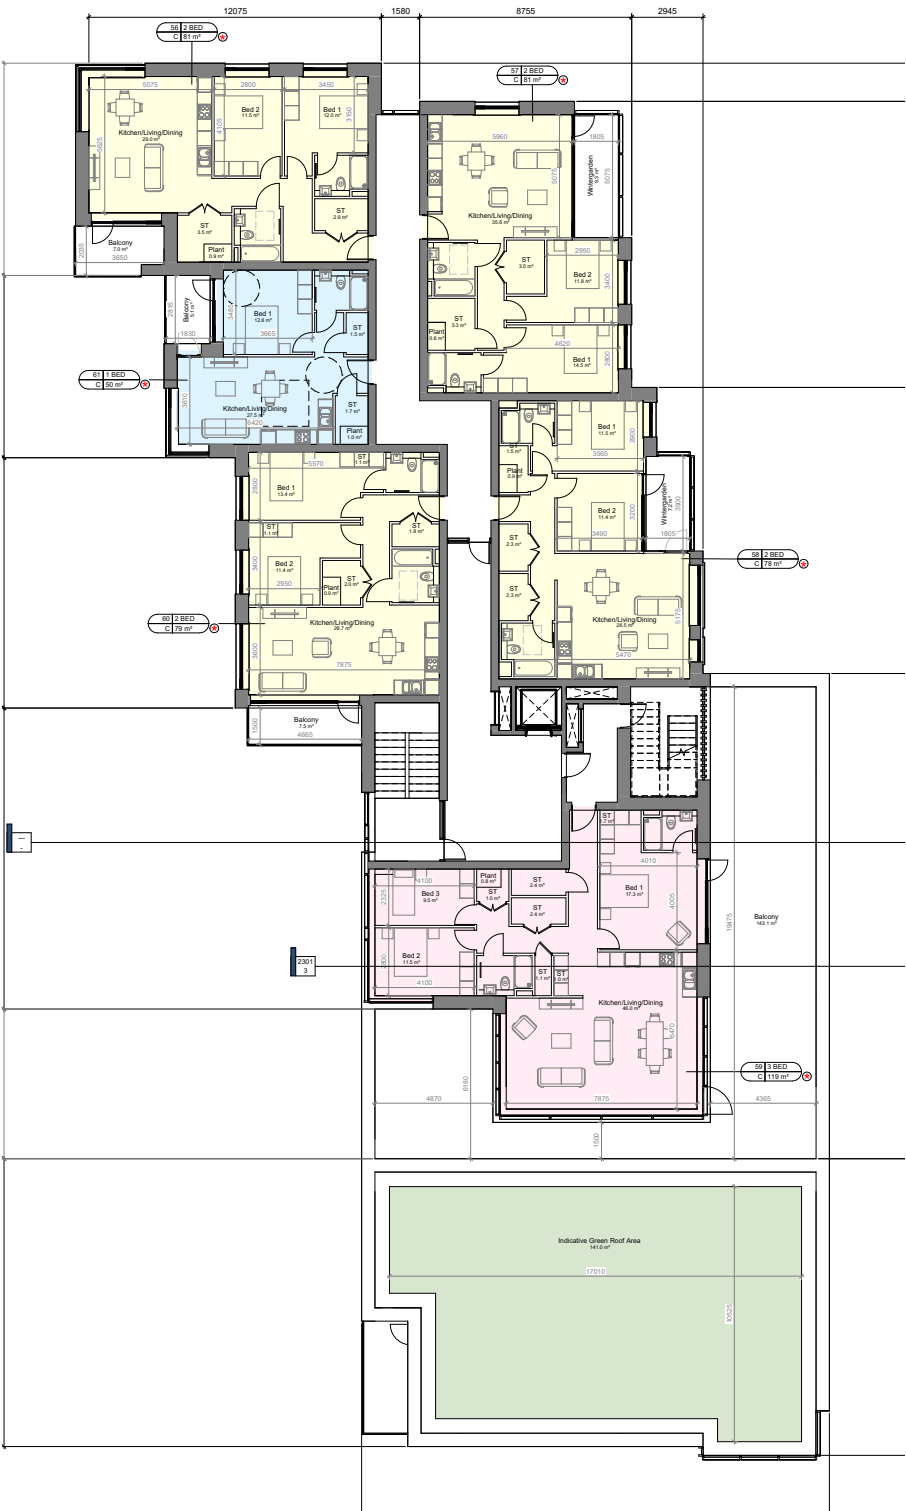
Block C - Sixth Floor Plan Source: MCORM, 2026.
